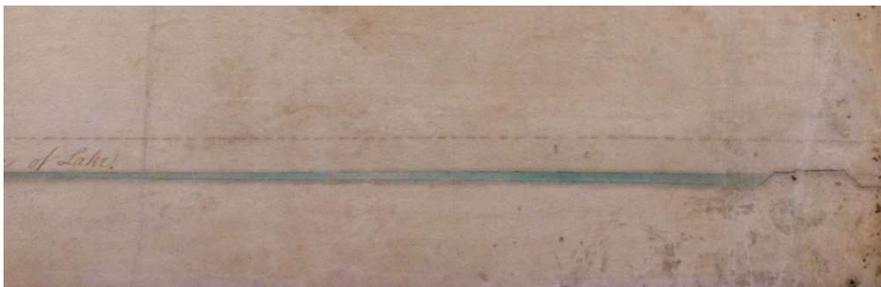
Detail from the plan for Wolterton (MSGD a4 fo.10) showing the dam.
